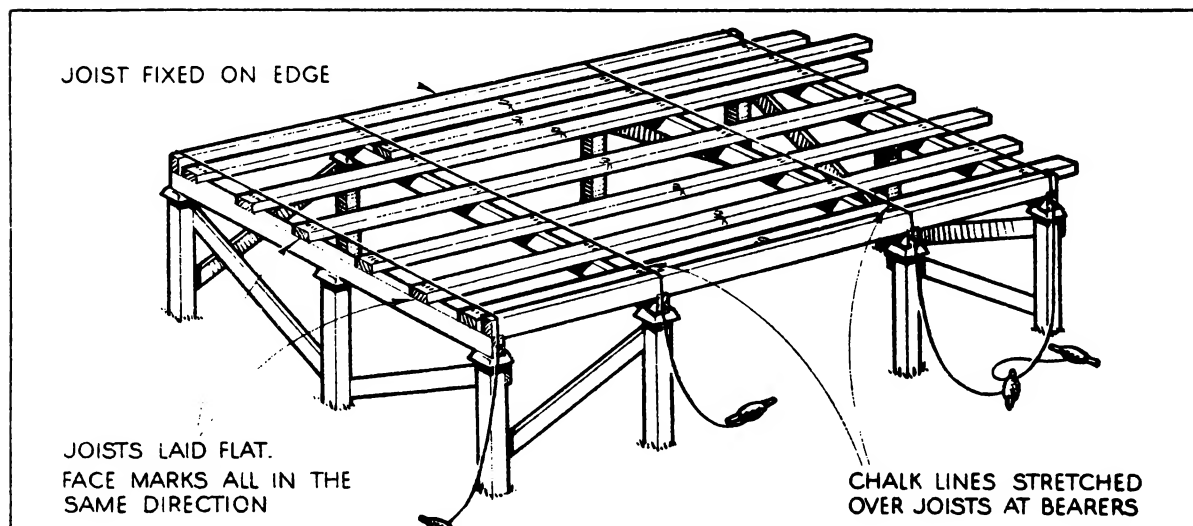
Method of Setting Out Floor Joists to Obtain a Level Floor.
